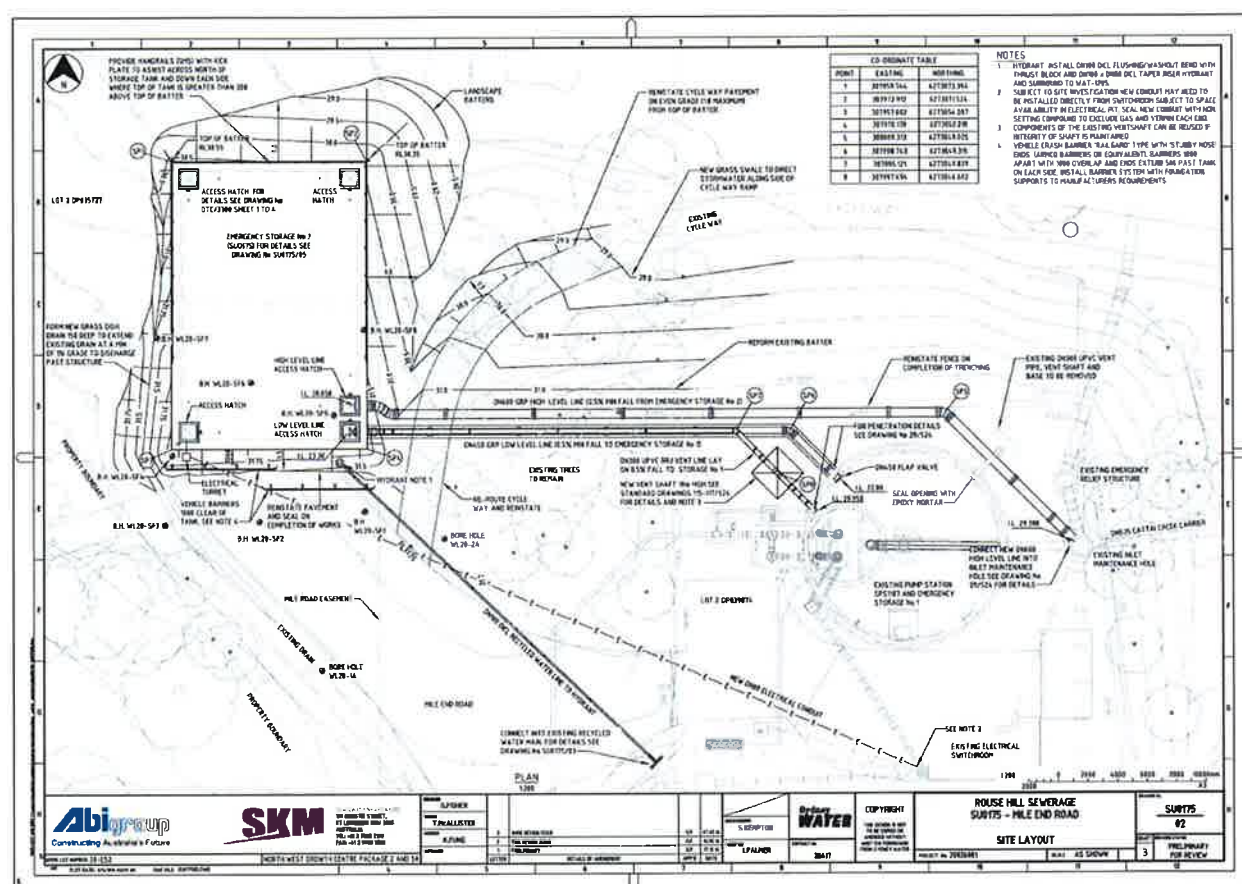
Plan view of EST (left) with connections to the existing pumping station (centre) (Source: EA 2014)
